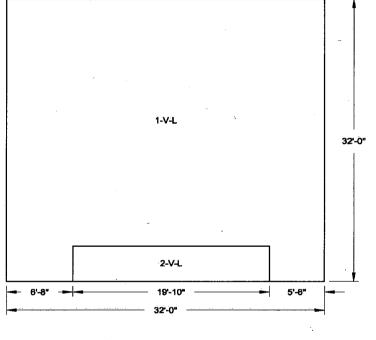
H.8-189: WALL 12 LOOKING FROM OUTSIDE TRANSVERSE REINFORCEMENT ZONES
